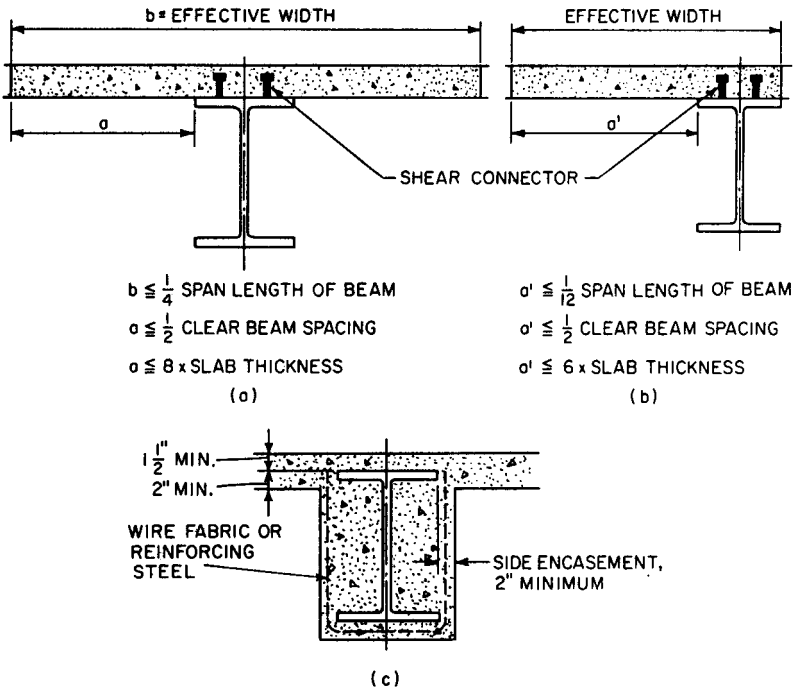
Steel-concrete composite-beam construction: (a) and (b) with welded-stud shear connectors; (c) with encasement in concrete.
